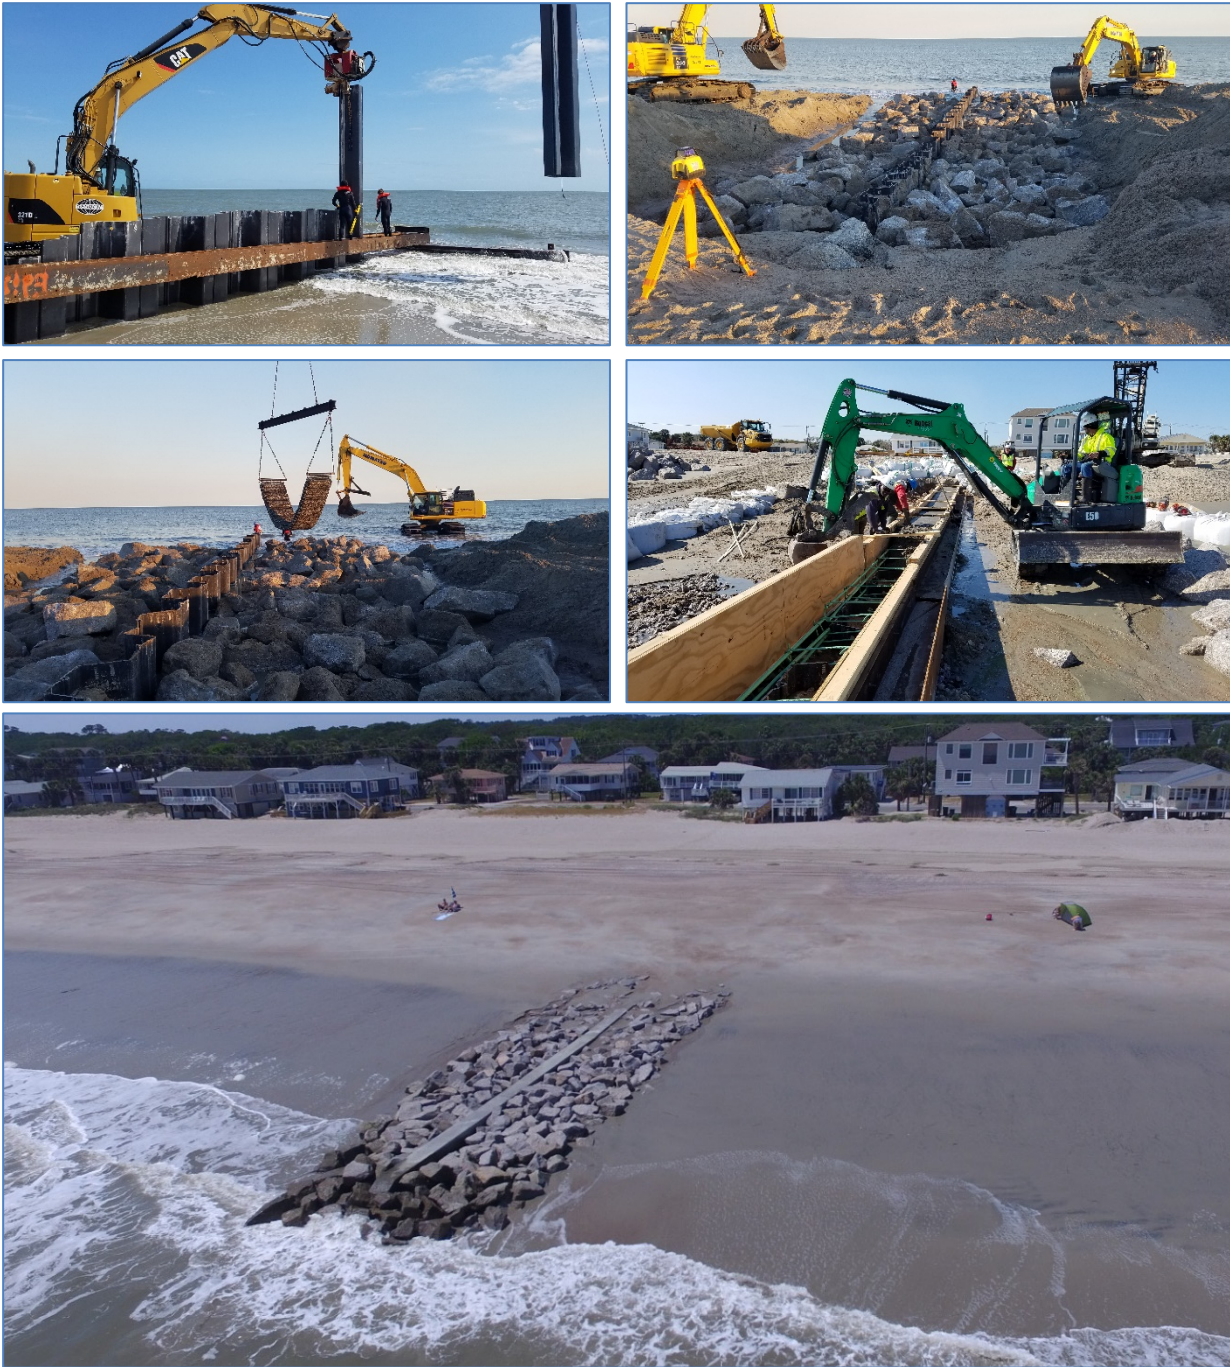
Photos of groin extension construction showing driving of sheets, placement of marine mattresses and armor stone, forming of concrete cap, and a completed extension.
